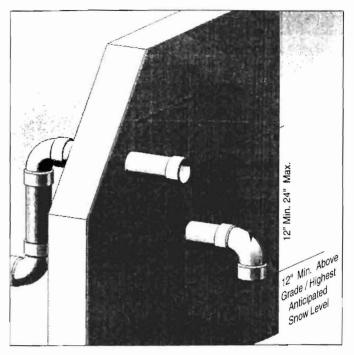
Direct Vent - Alternate Sidewall Termination of Vent and Combustion Air Piping
